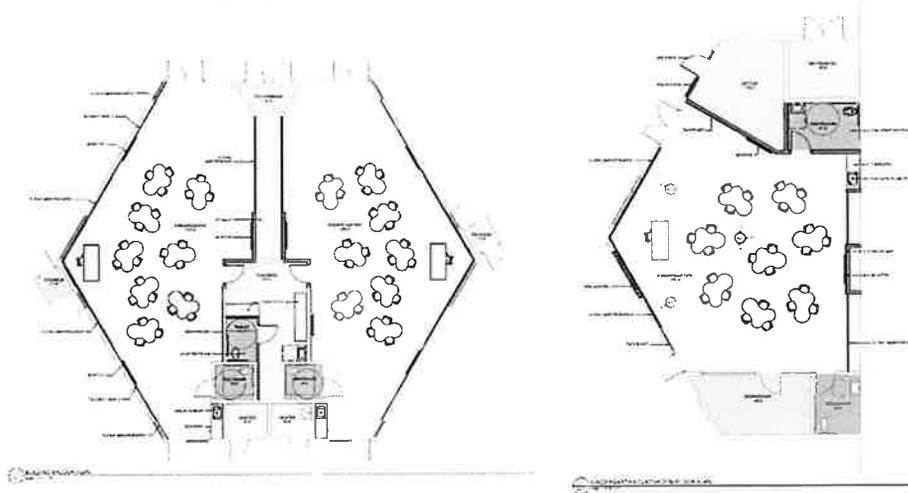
depict a sample preschool, TK and K classroom floor plans of new and modernized facilities designed to meet District specifications, Title 5 and Title 22 requirements for K, TK, and preschool classrooms.
